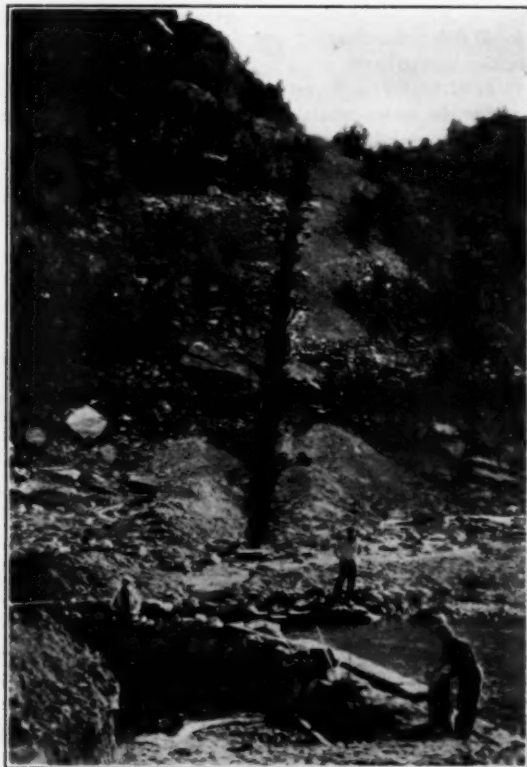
PIPE-LINE DITCH IN SOLID ROCK ACROSS SMALL STREAM AND UP CANYON WALL
